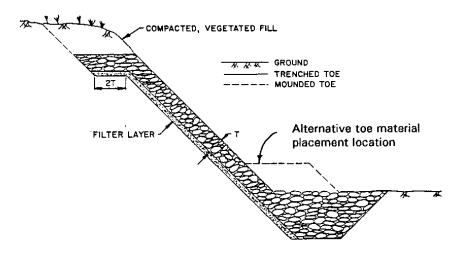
Typical Riprap Installation: End View (Bank Protection Only)
